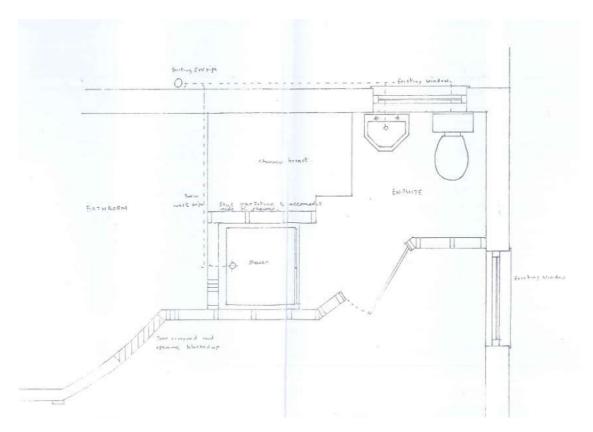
; Partial first floor plan showing the modern studwork construction of the en-suite from application 21921/013.
